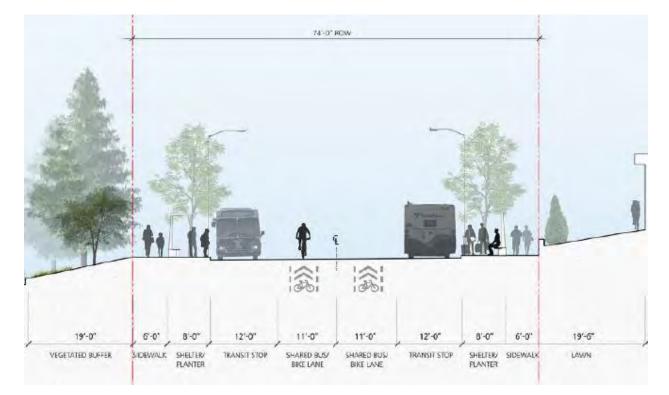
Preliminary NE 185th Street Transit Center Cross-Section
